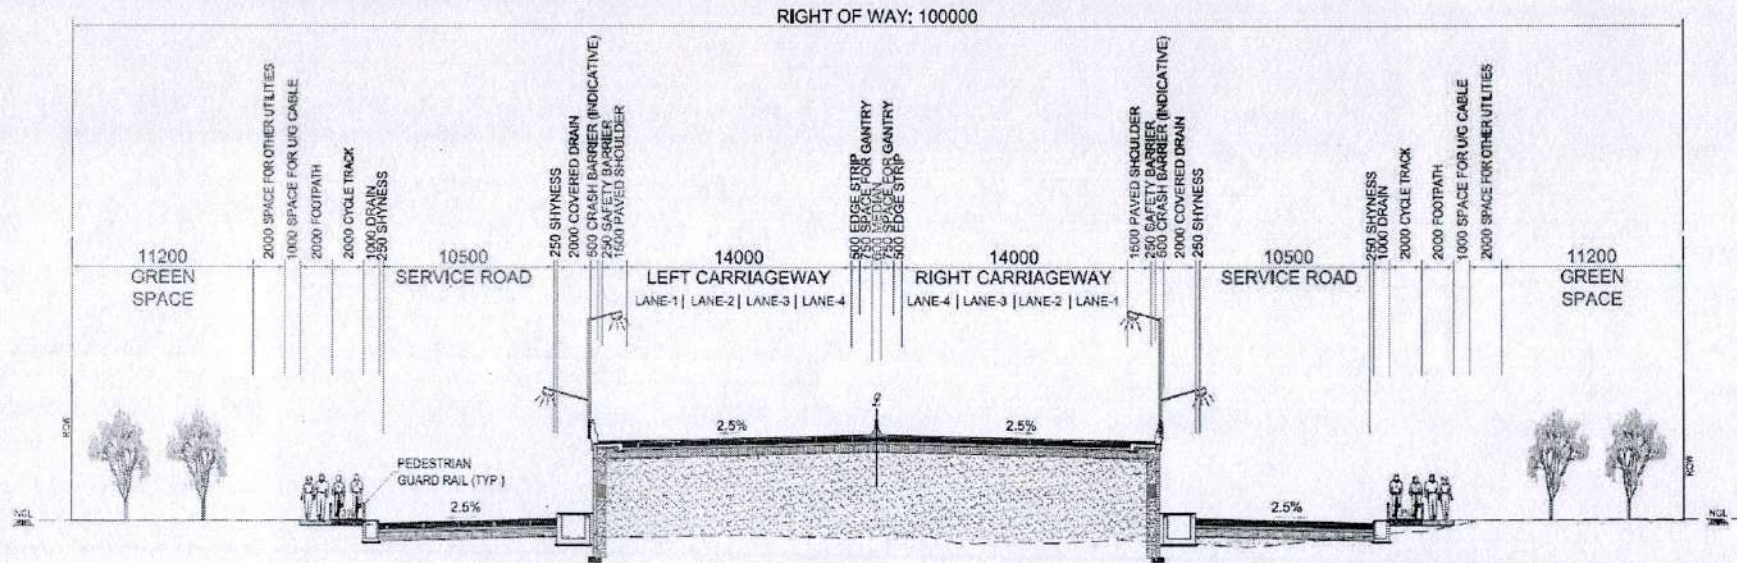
Typical cross section at Hosur Road Flyover Approach Location
